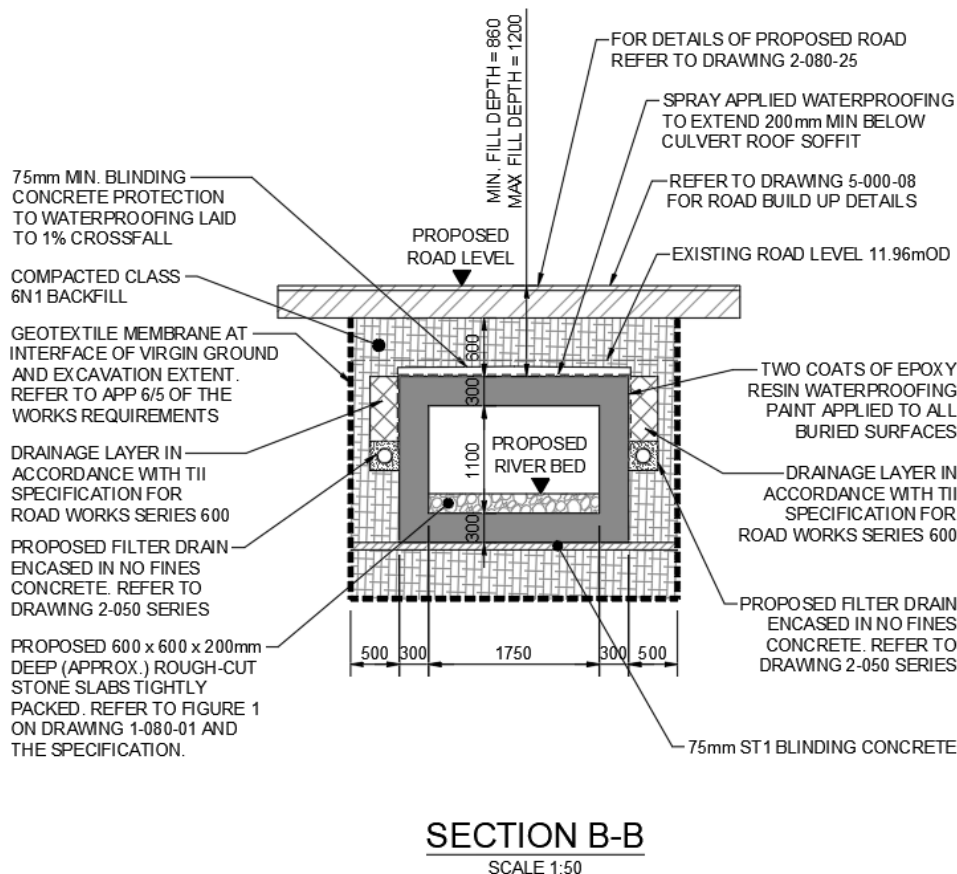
Springmount Stream Culvert Typical Cross Section
